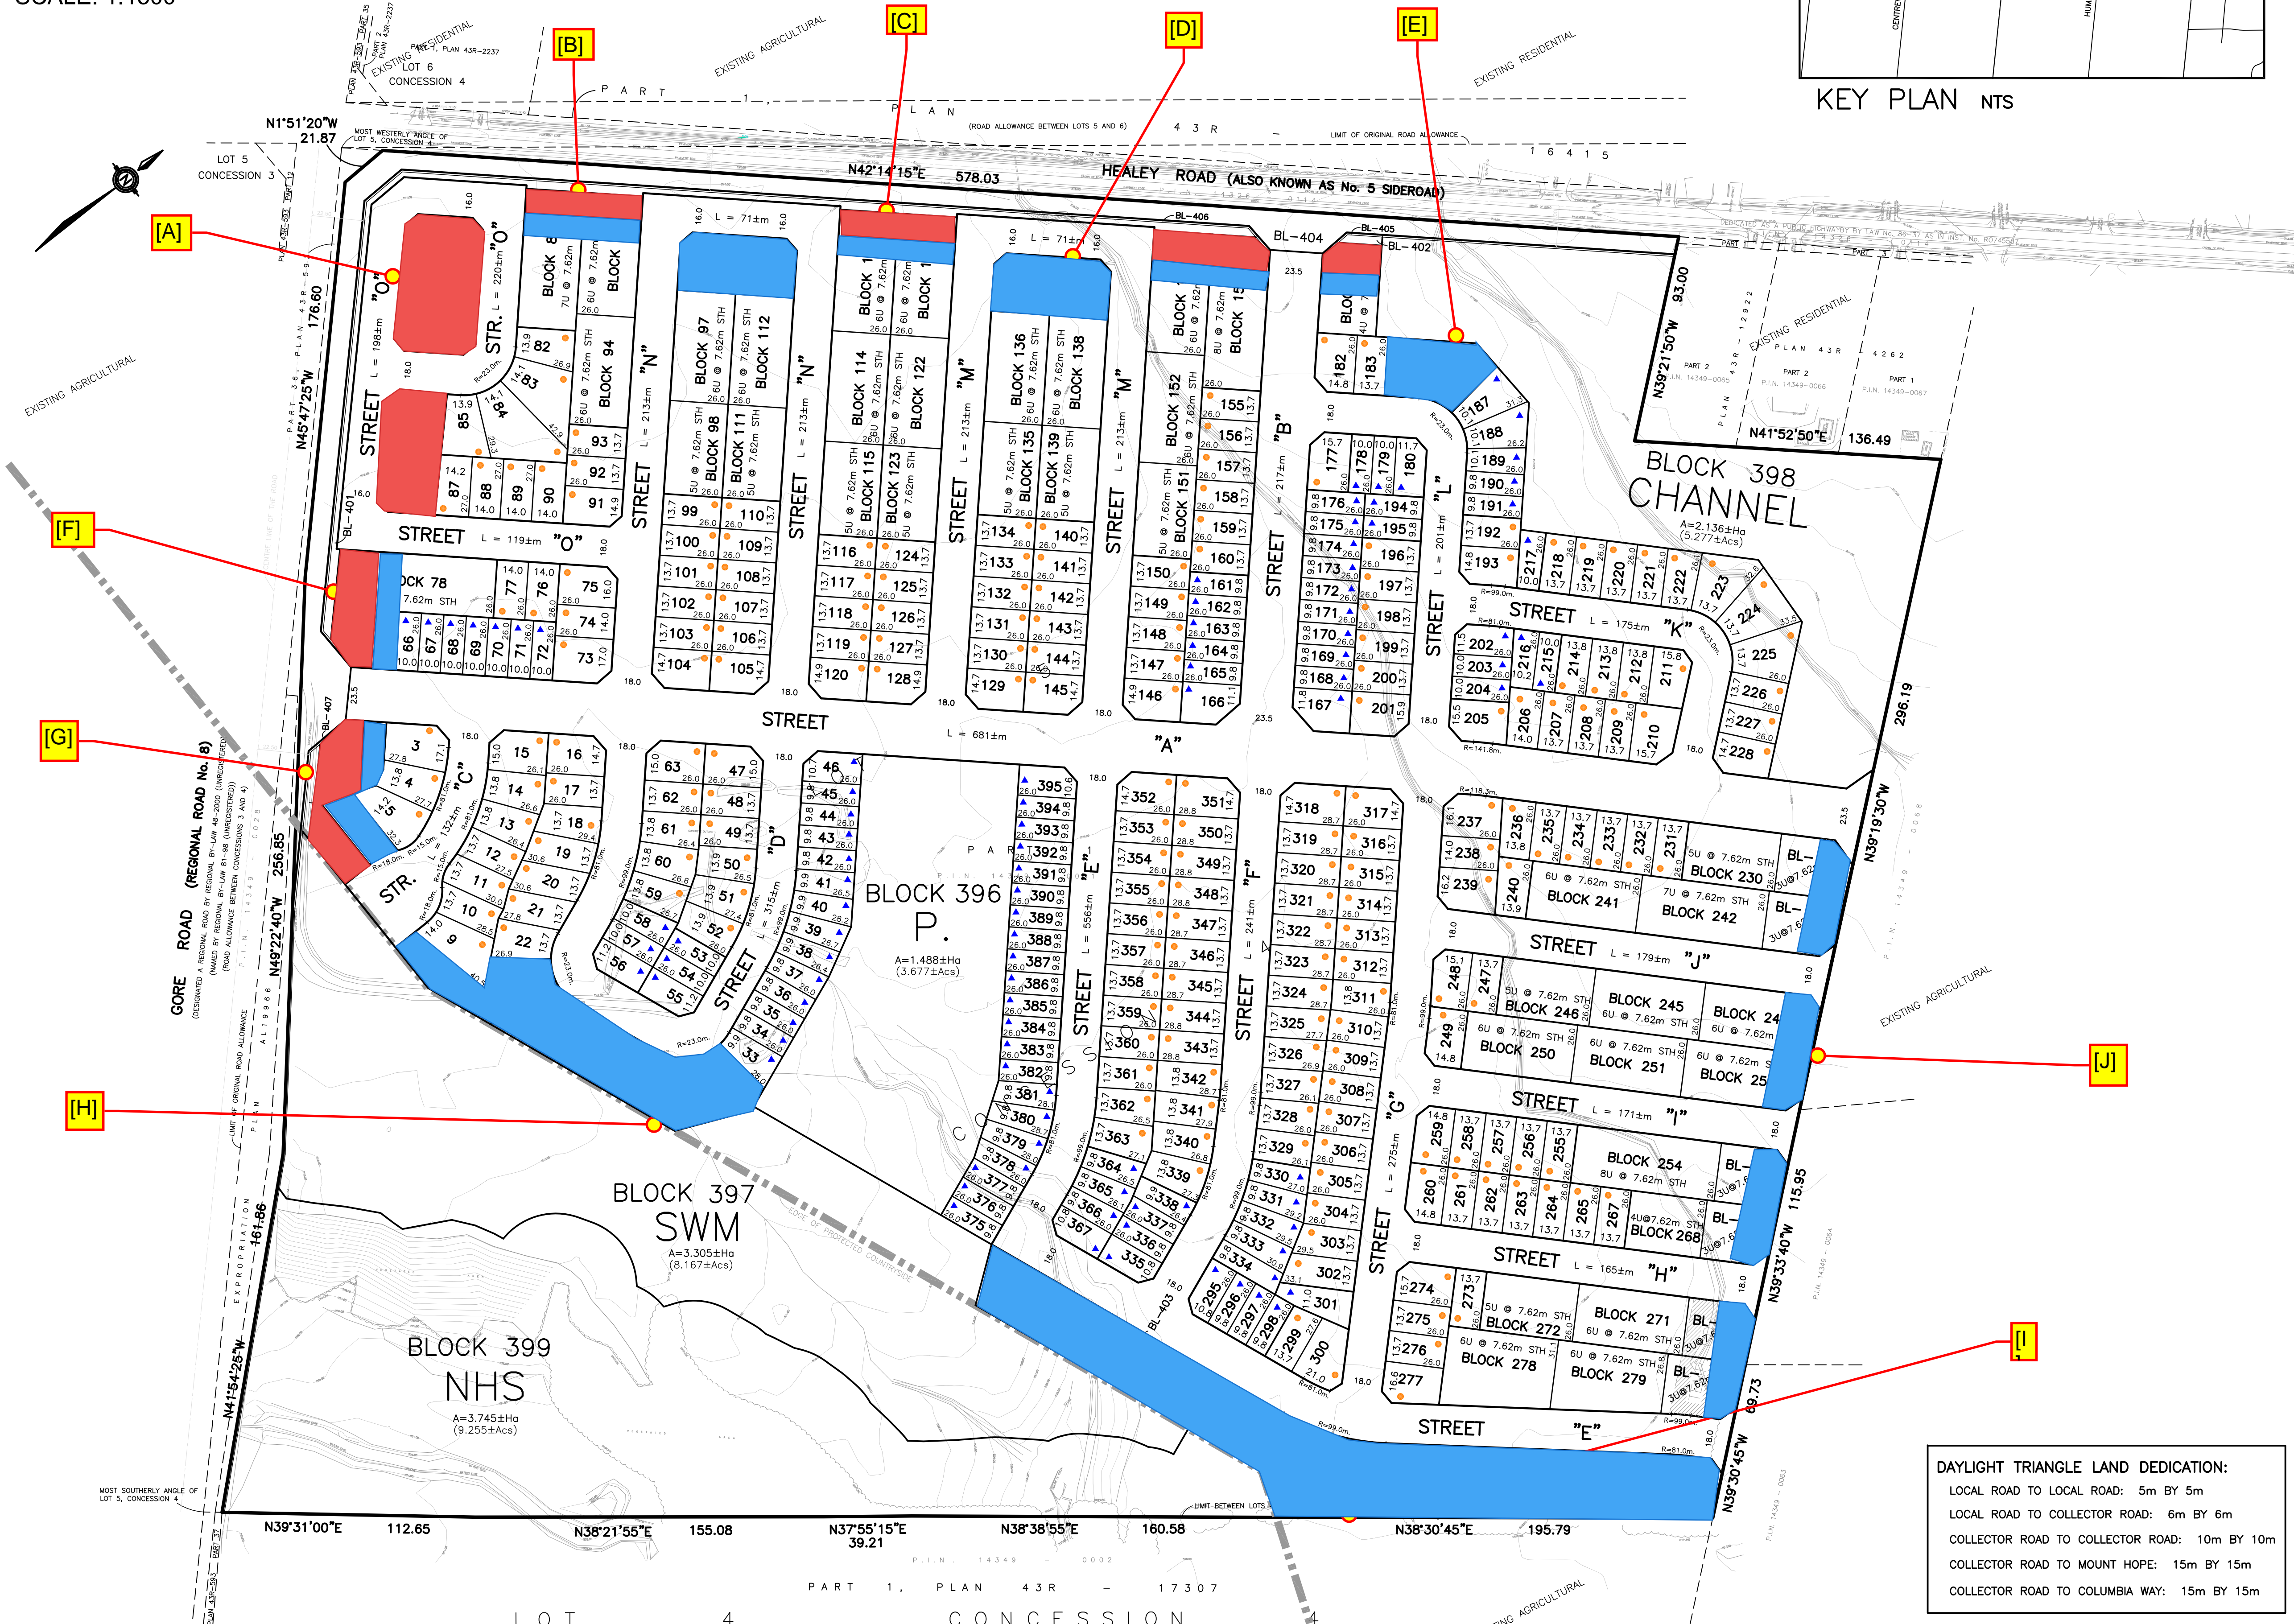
Draft Plan indicating Showing Ventilation Requirements
